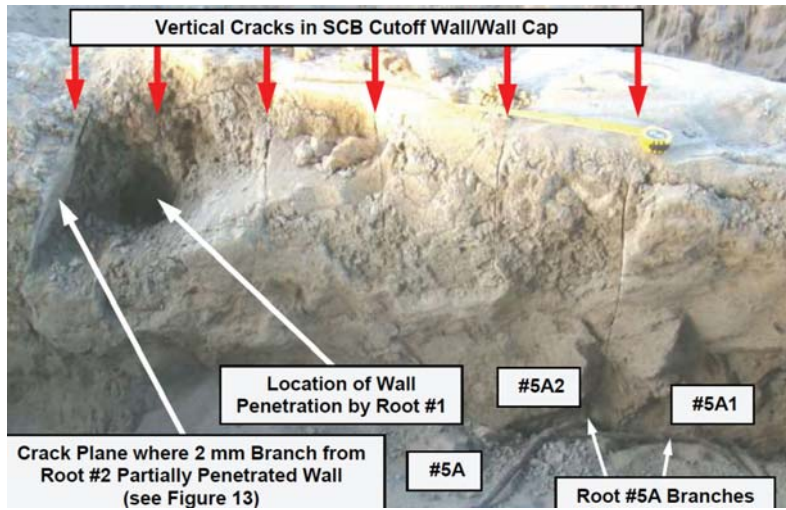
, Cracks revealed in an exploratory excavation adjacent to a soil-bentonite cutoff wall (Harder et al 2009)
